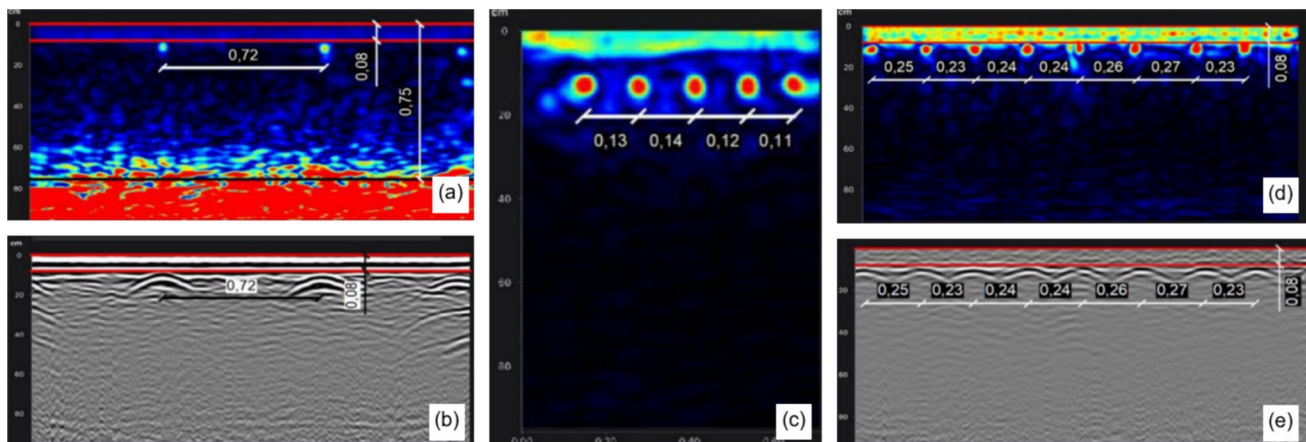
Georadar detection of longitudinal bars on the long side (a, b) and on the short side (c) and of transversal rebars (d, e) in the cross-section of the columns
